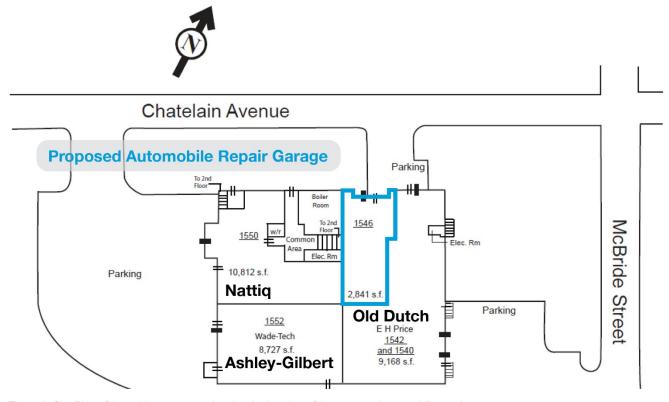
Site Plan of the subject property showing the location of the proposed automobile repair garage
